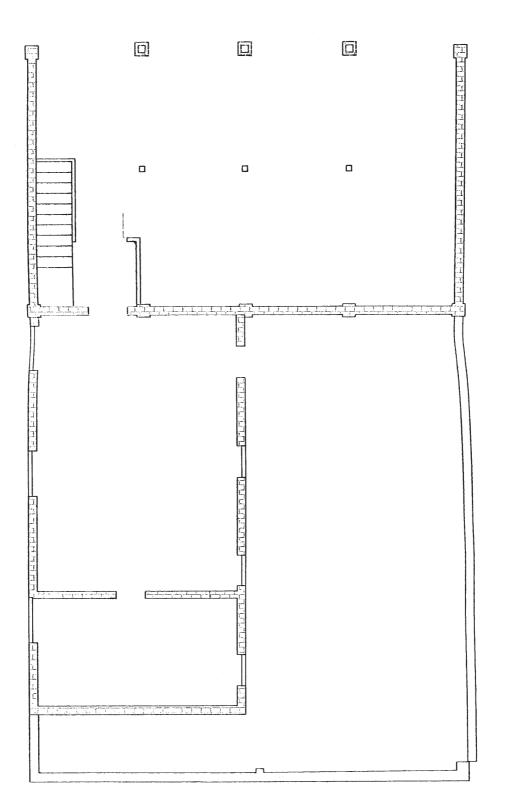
Cart lodge/granary and stable: ground-floor plan as it is now.
